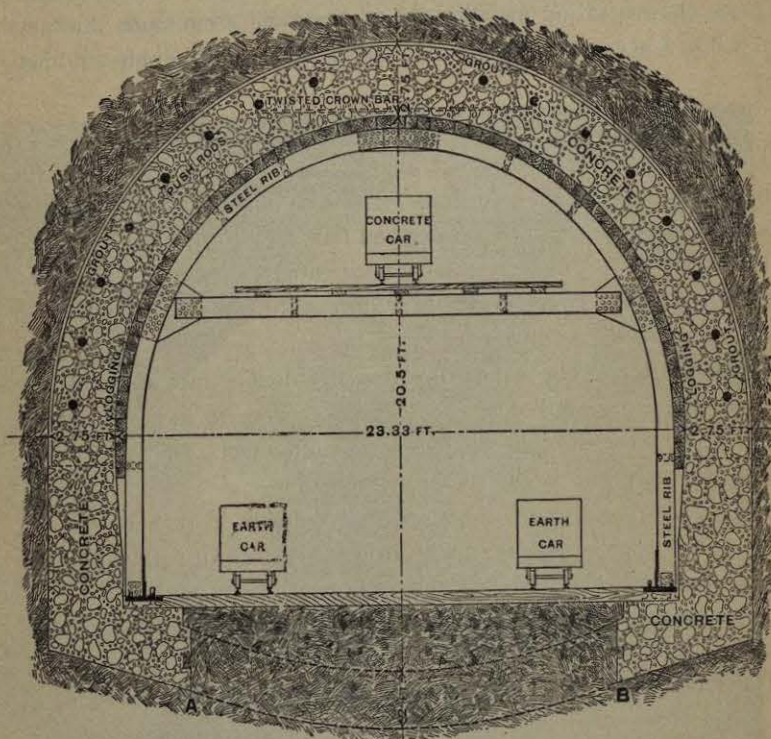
Section of East Boston Tunnel during Construction. (See p. 691.)
